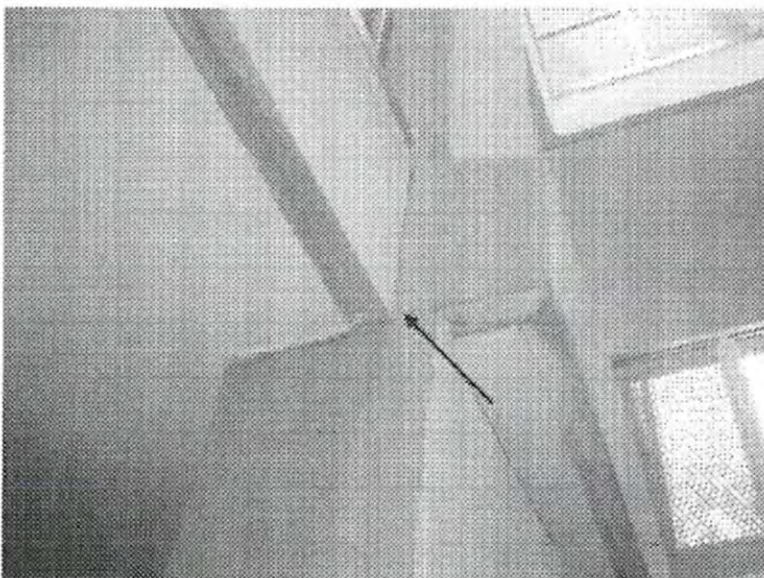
Crack visible at column adjacent to breezeway where deflection control joint has been filled with stucco.
